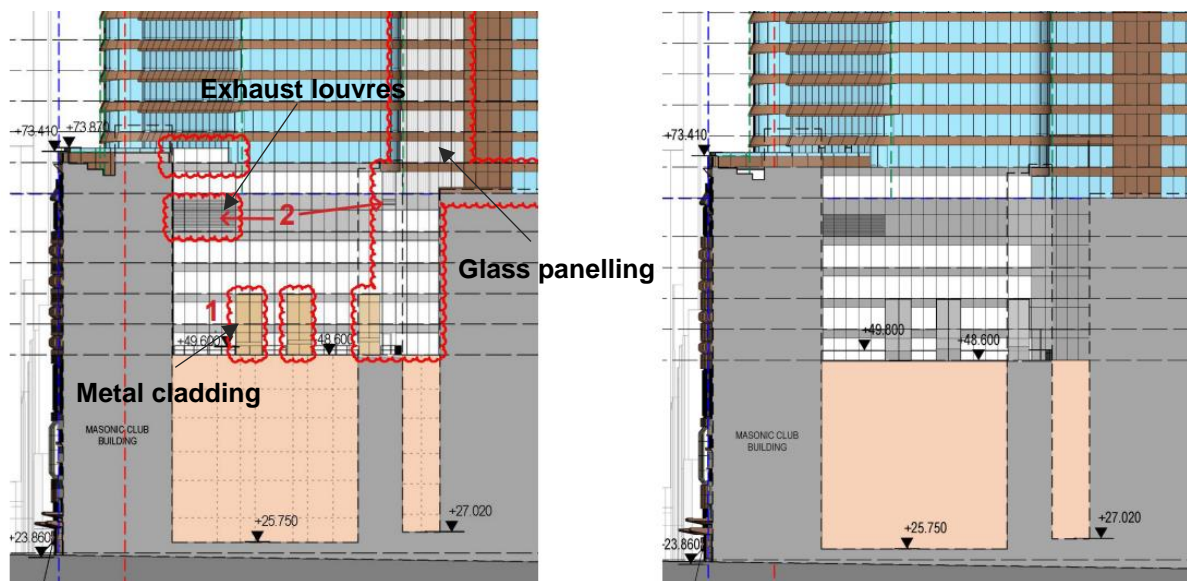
| Proposed northern elevation (left) compared to approved northern elevation (right) (Source: Modification Report)
